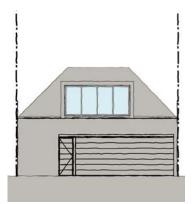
OUTBUILDING WITH A FRONTAGE TO A LANEWAY
